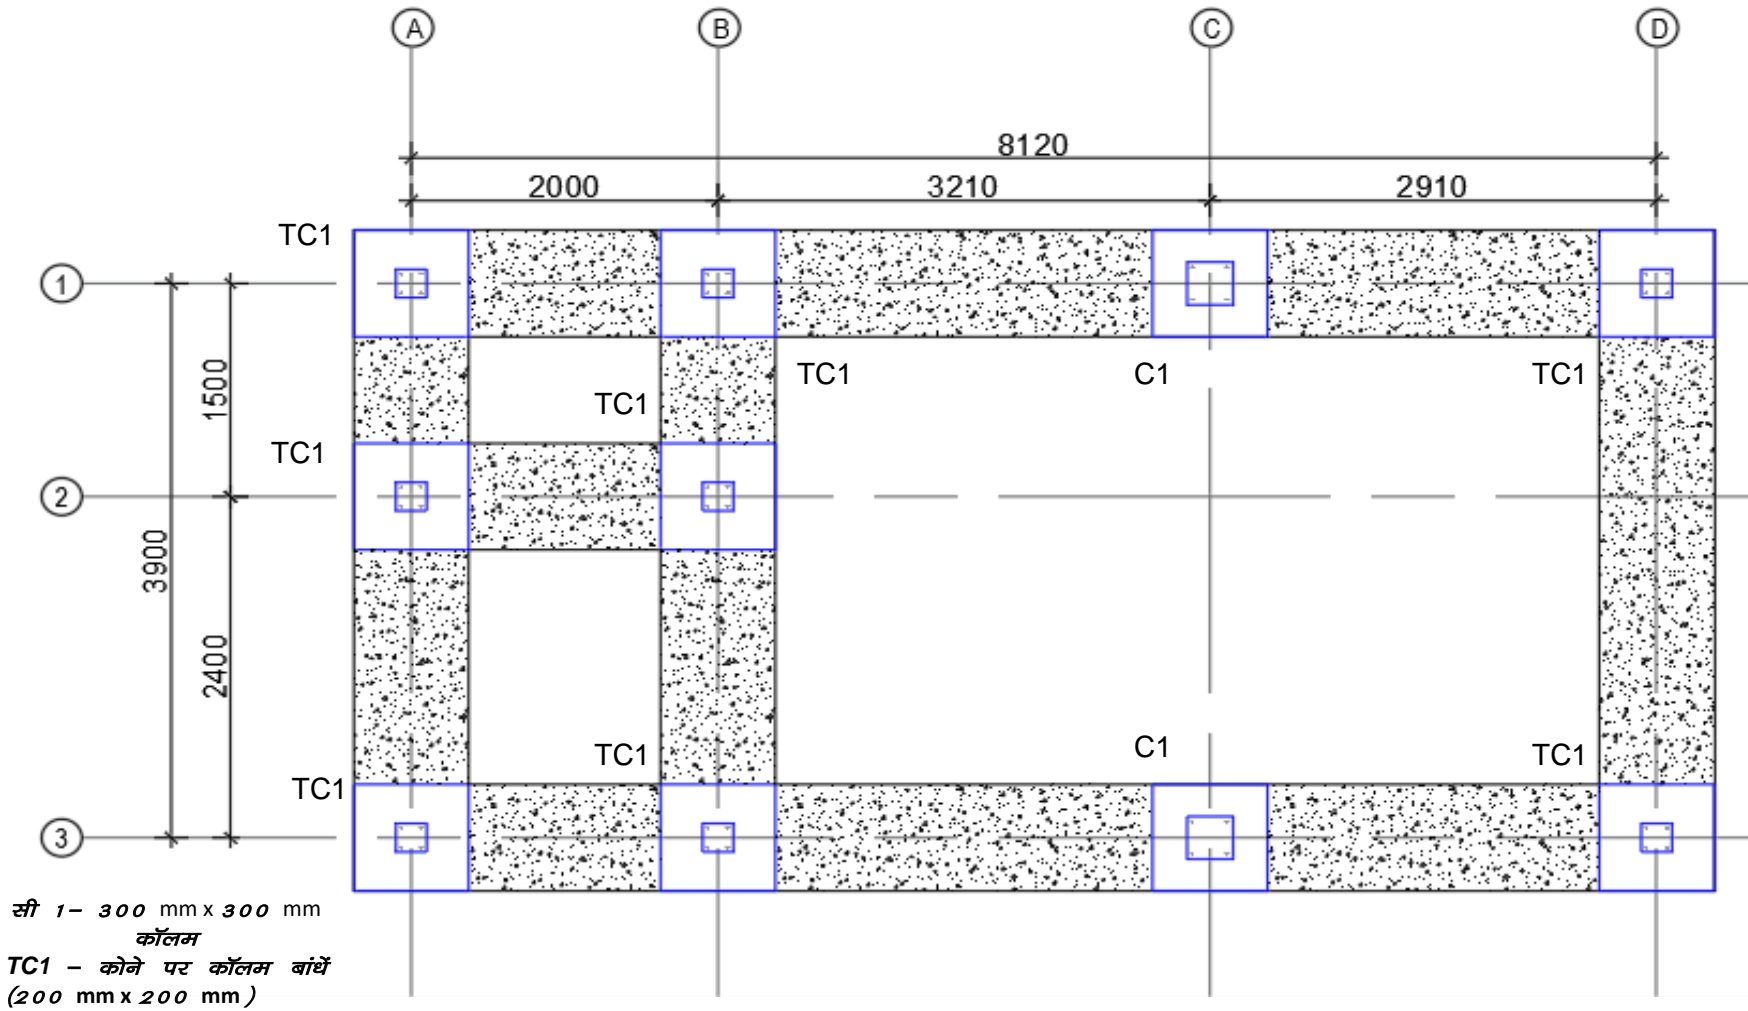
Foundation Trenches with P.C.C. (For details, refer page 22)
